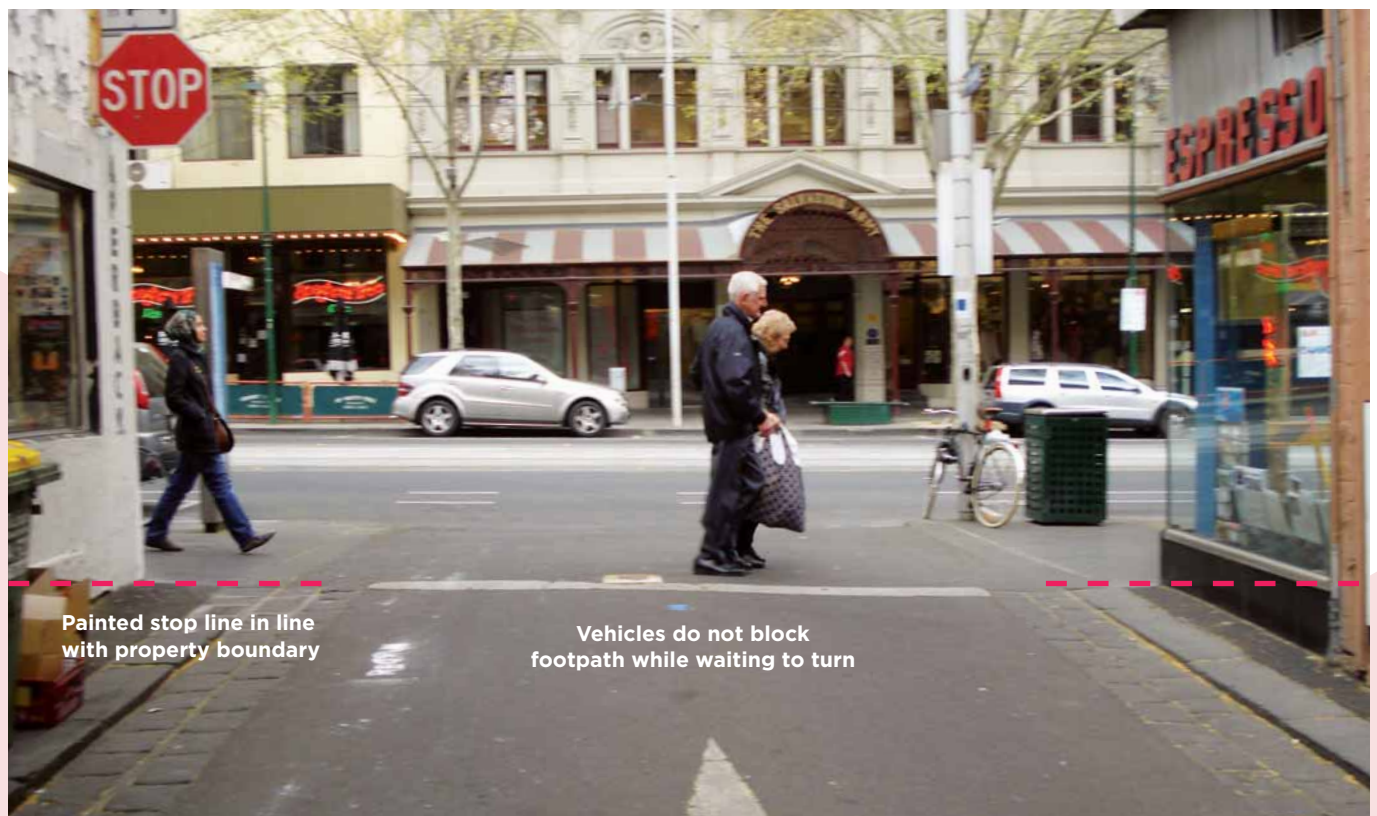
Example of stop line on property line at Crossley Street facing Bourke Street
